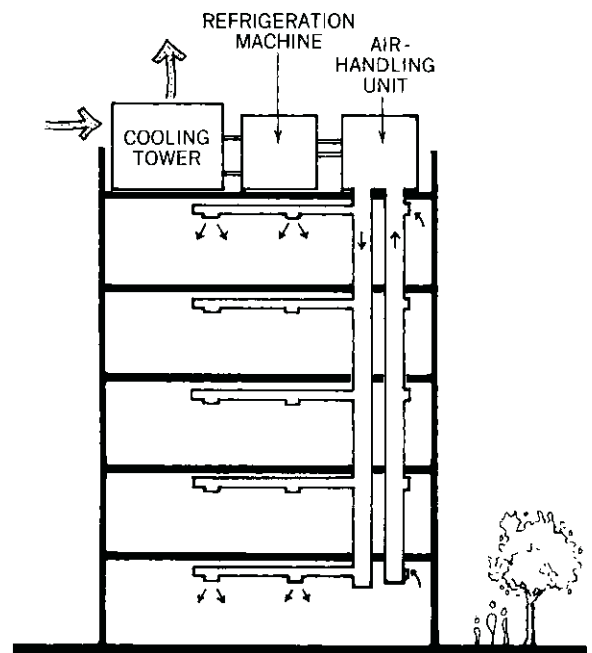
This section shows a typical multistory building with a rooftop central-station mechanical system. In this case, the air-handling unit on the roof serves all floors.
